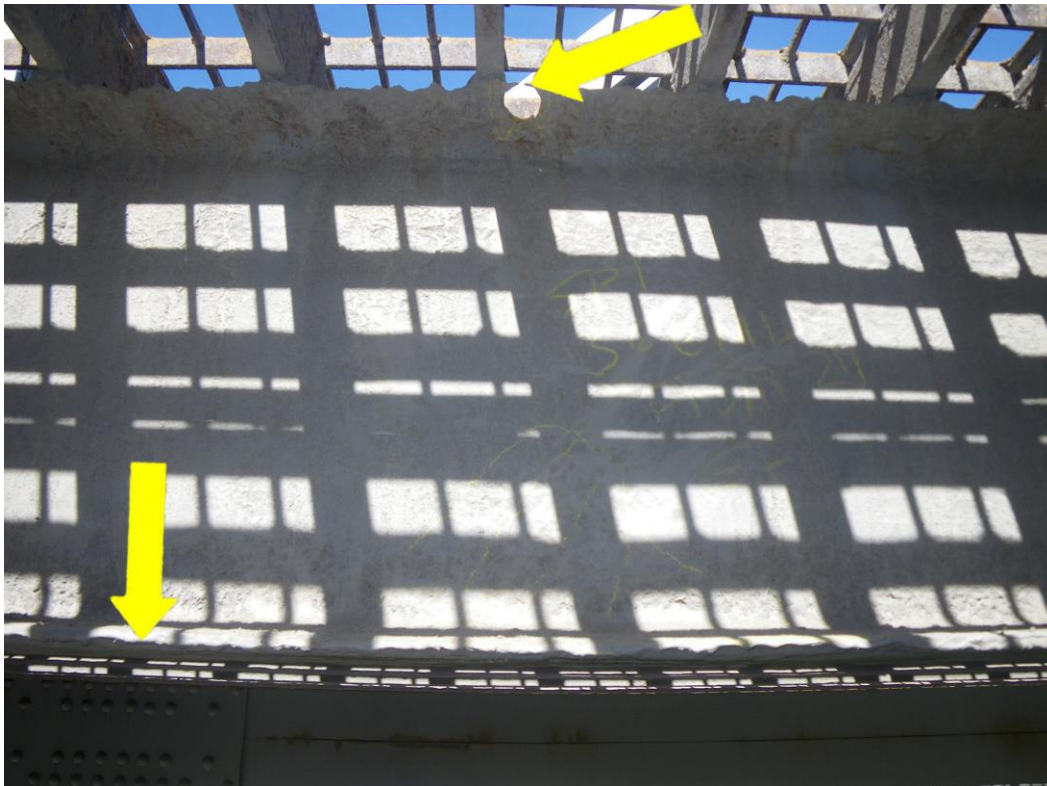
Stringer S6 at Midspan, between Floorbeams FB1N and FB2N, East Face, Span 1 - Section loss of flanges and web. Note top flange with 100% section loss of the outer edge including a vacant drilled hole.
